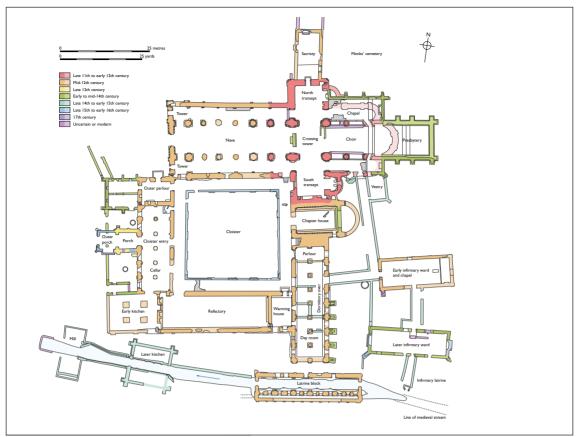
Site plan of Castle Acre Priory. ©Historic England Archive
